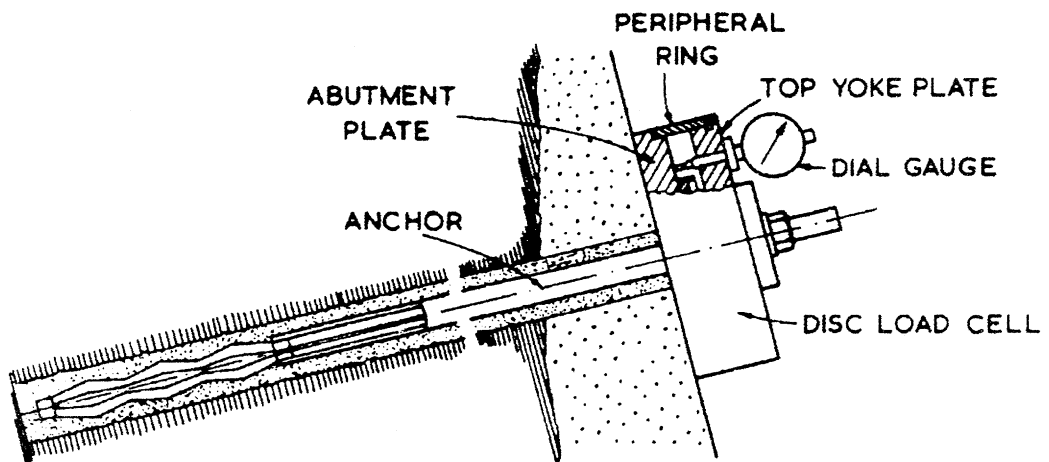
Typical load cell installation for a tieback anchor (Hanna, 1985).
